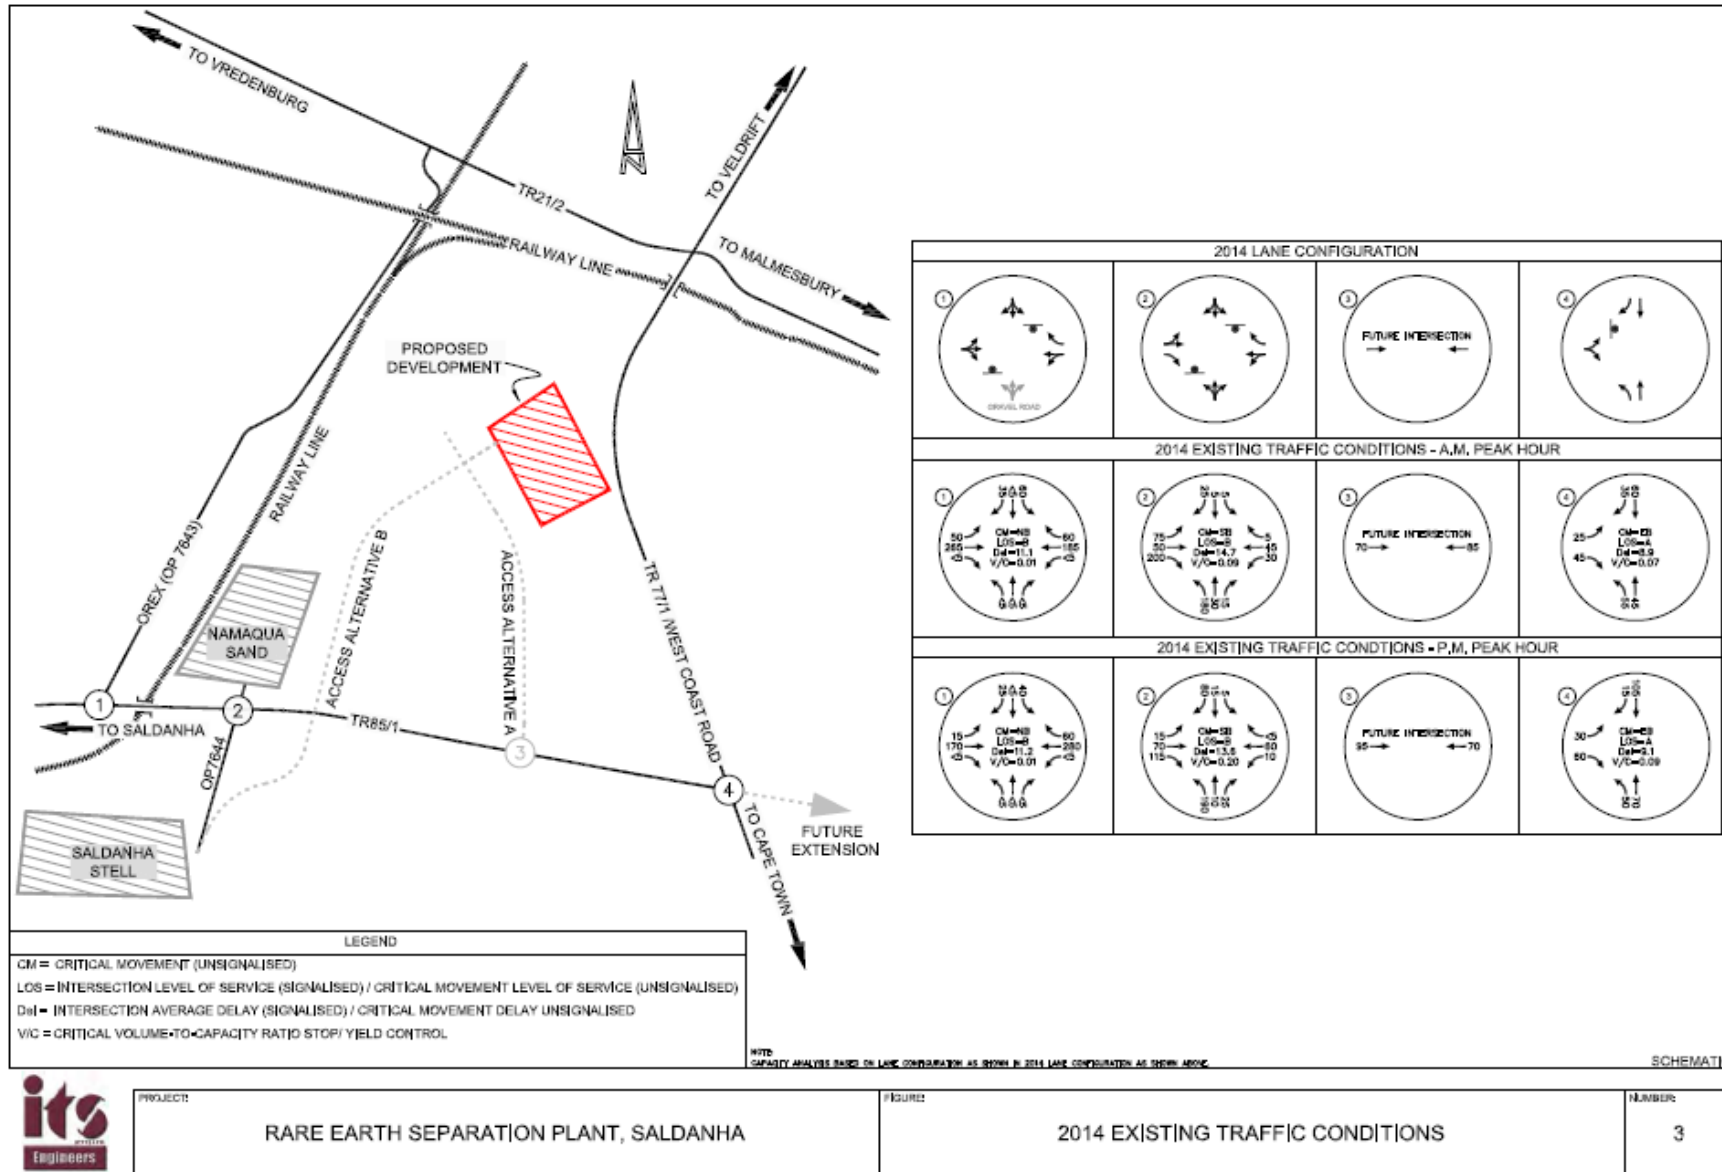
Conceptual Access Plan Sketch indicating both alternative access roads A and B
